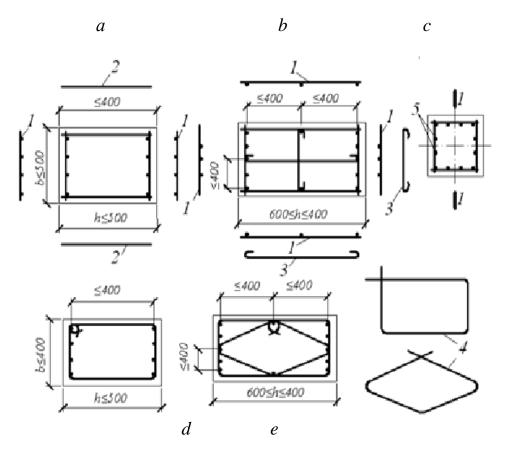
Reinforcement of compressed elements: a, b, c – welded cages; d, e – tied; 1 – welded cages; 2 – connecting bars, 3 – hairpins; 1-1 – bending moment plane; 4 – closed stirrup
